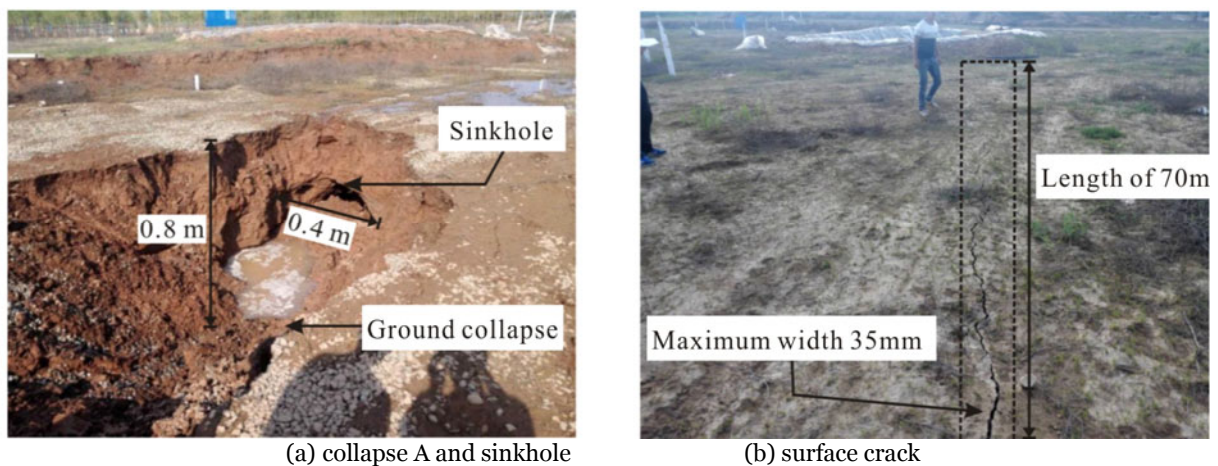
Collapse and surface crack in Water Immersion Test (WIT): a. collapse A and sinkhole; b. surface crack.
